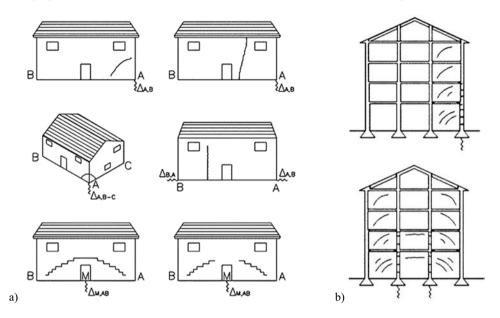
Typical crack patterns of (a) masonry buildings and of (b) R.C. buildings subjected to foundation settlements.
